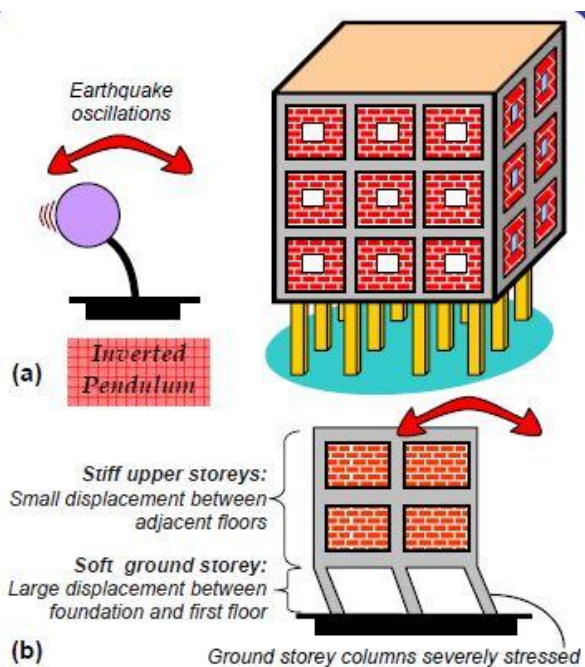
Upper storeys of open ground storey building move together as a single block – such buildings are like inverted pendulums.
